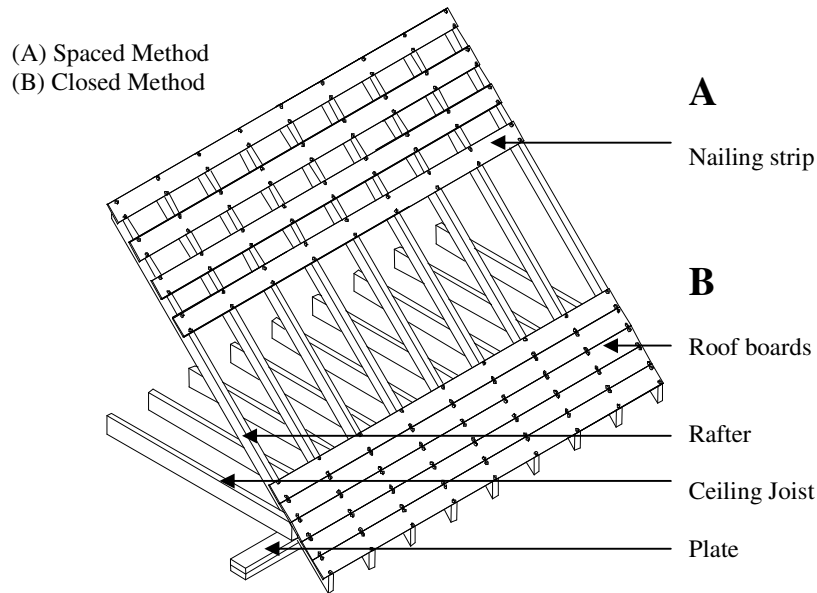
Application of structural wood panel roof sheathing [12,16]
